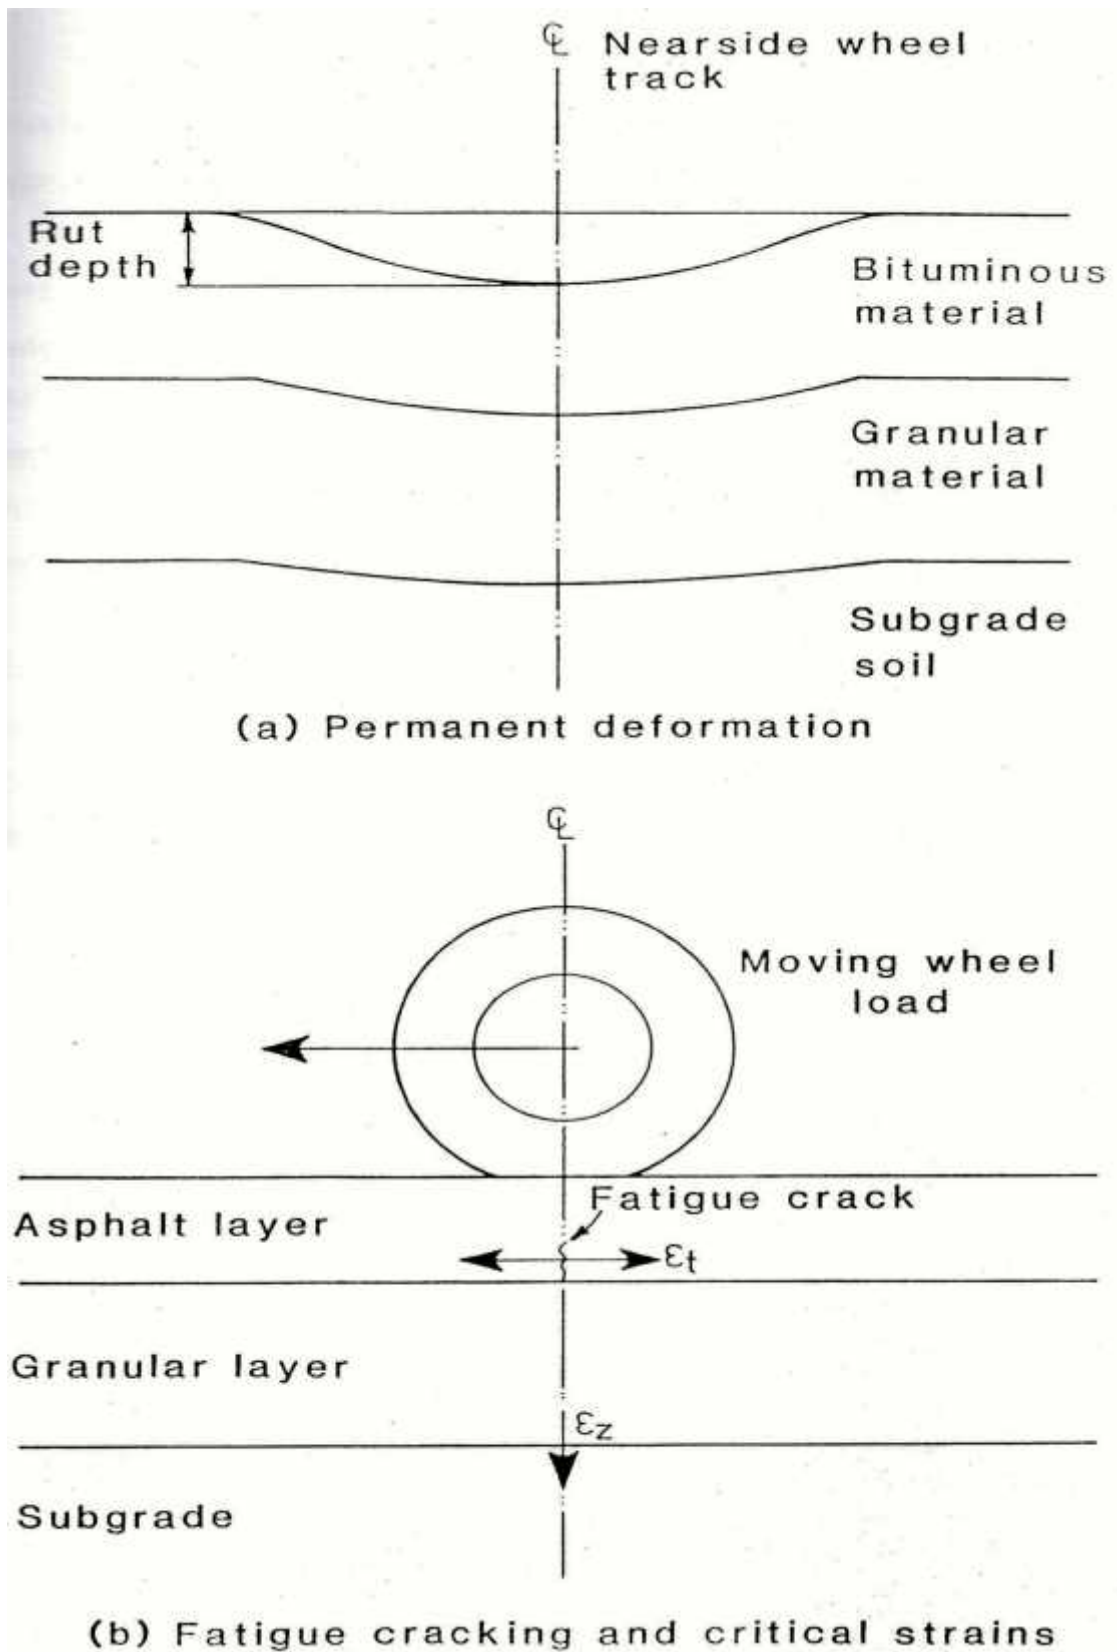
Failure Modes and Critical Strains in Asphalt Pavement
